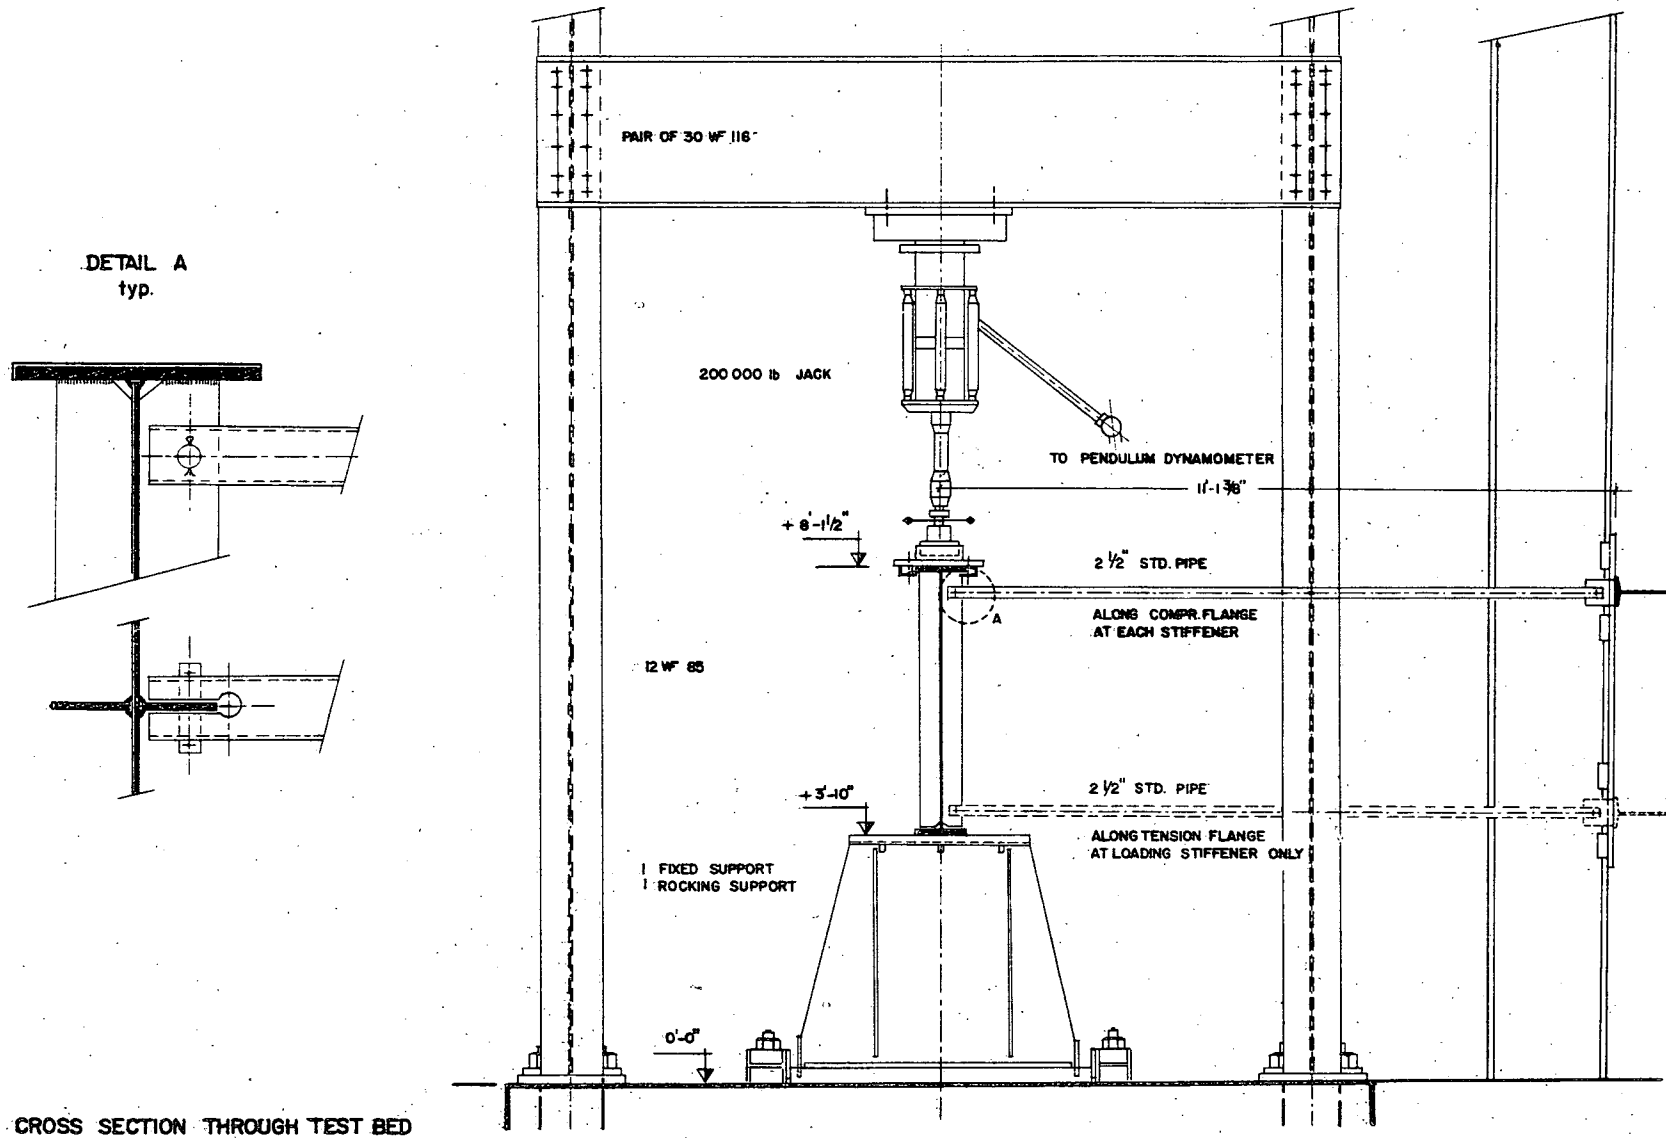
OVERALL VIEW OF TEST SETUP
